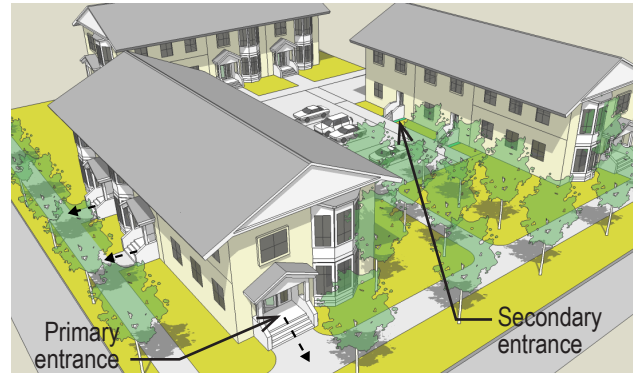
d.1.a.i. (1) Primary entries open directly to street right-of-way. Secondary entrances face parking lots.
